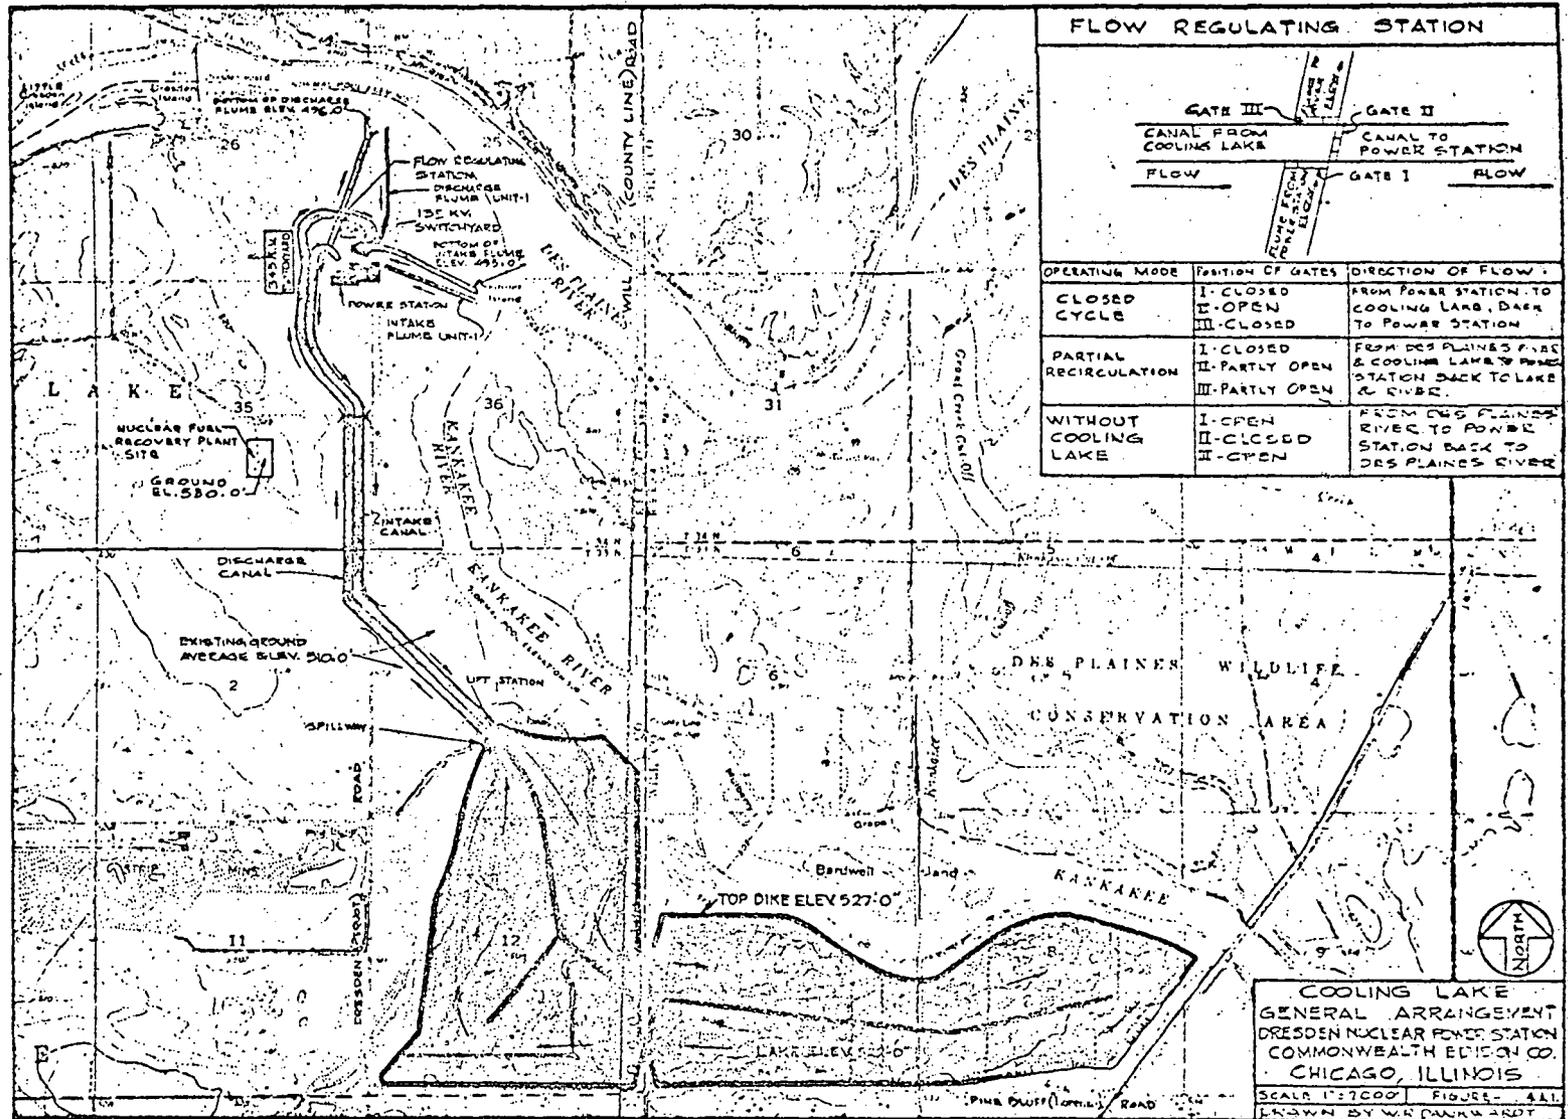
COOLING LAKE GENERAL ARRANGEMENT
